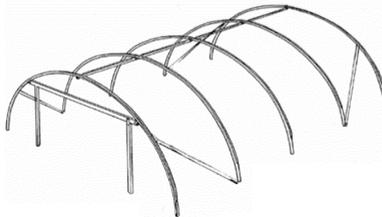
CONSTRUCTED POLYTUNNEL FRAME
